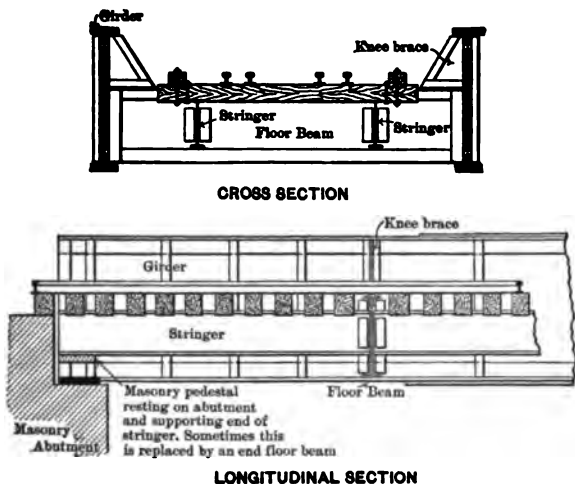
Half-Through Single Track Plate Girder Railroad Bridge.
